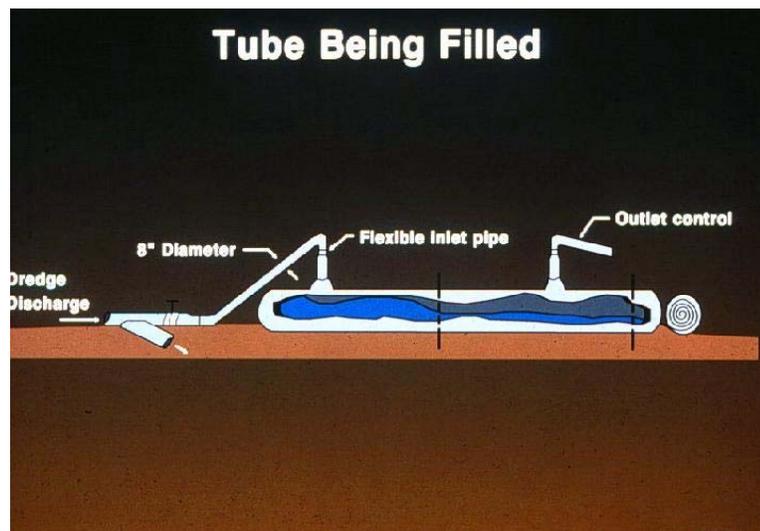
Drawing illustrating a geotube being filled from a dredge pipe.
